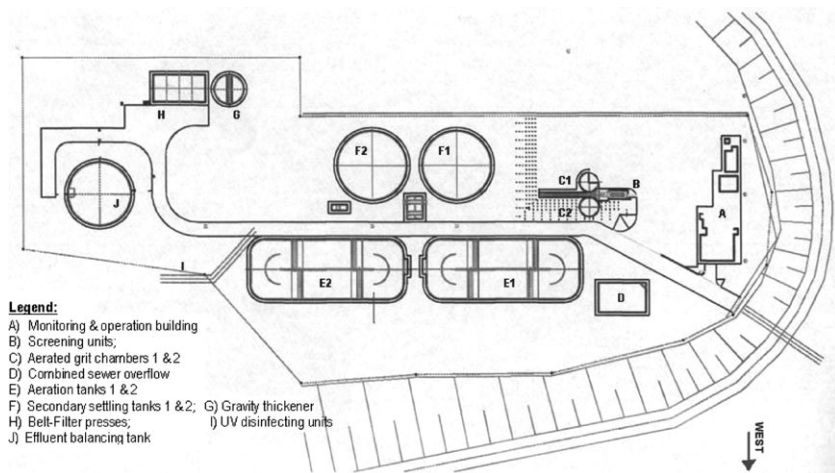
Layout of Al-Bireh wastewater treatment plant (not to scale).
